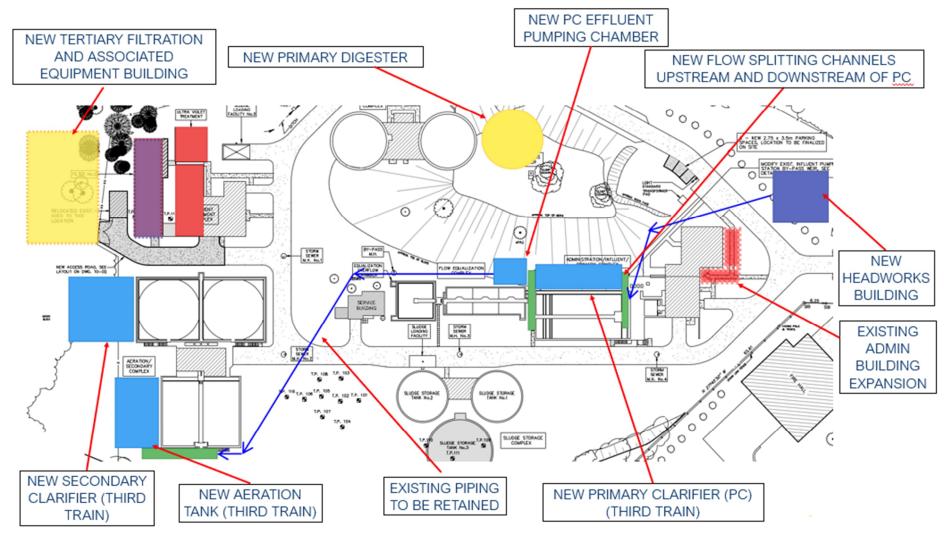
Conventional Activated Sludge (CAS) Facility Expansion Layout
